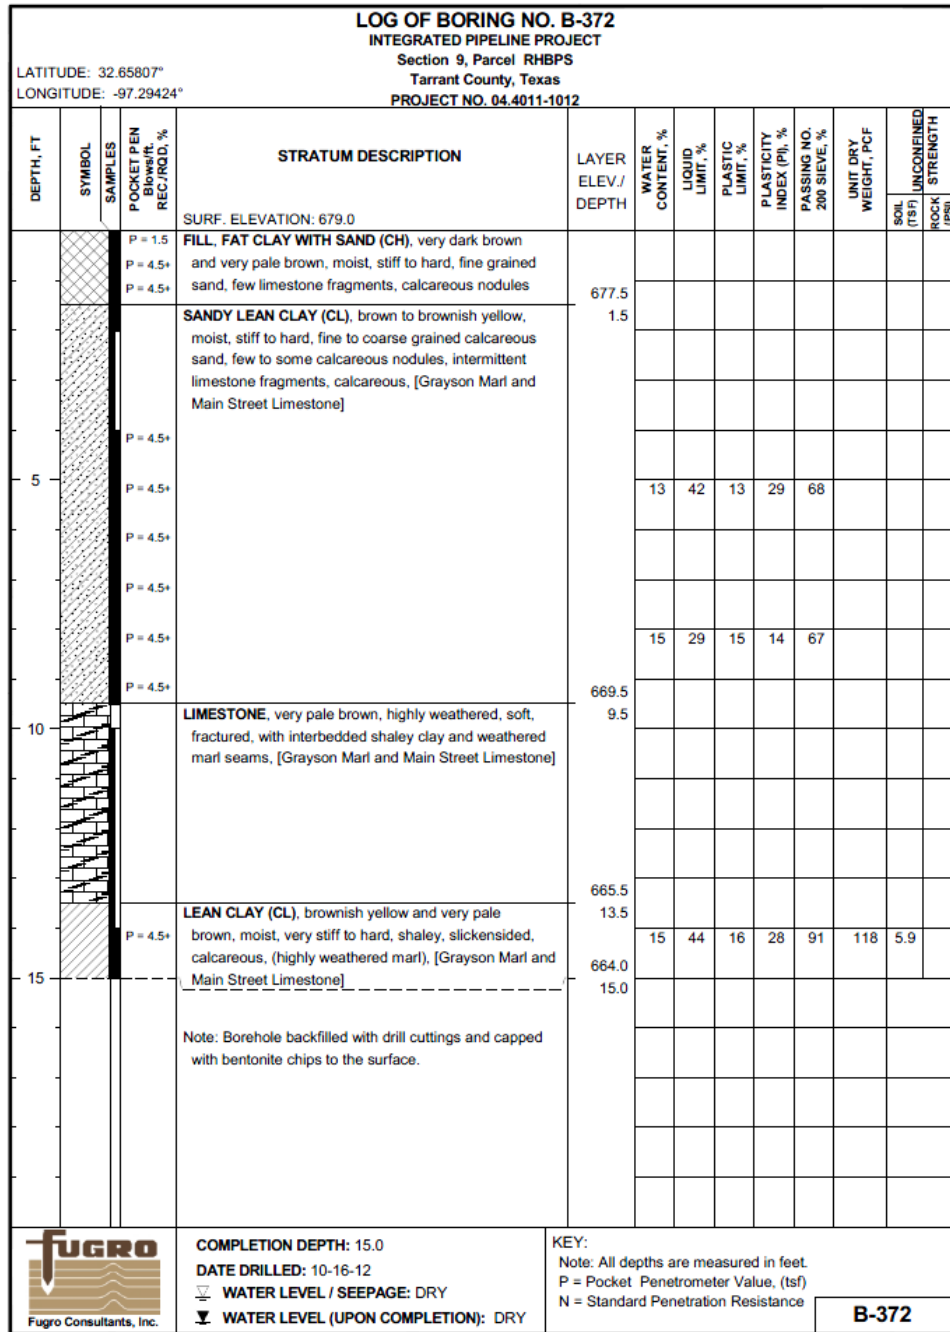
Soil log profile for the trench wall in the conducted field tests
